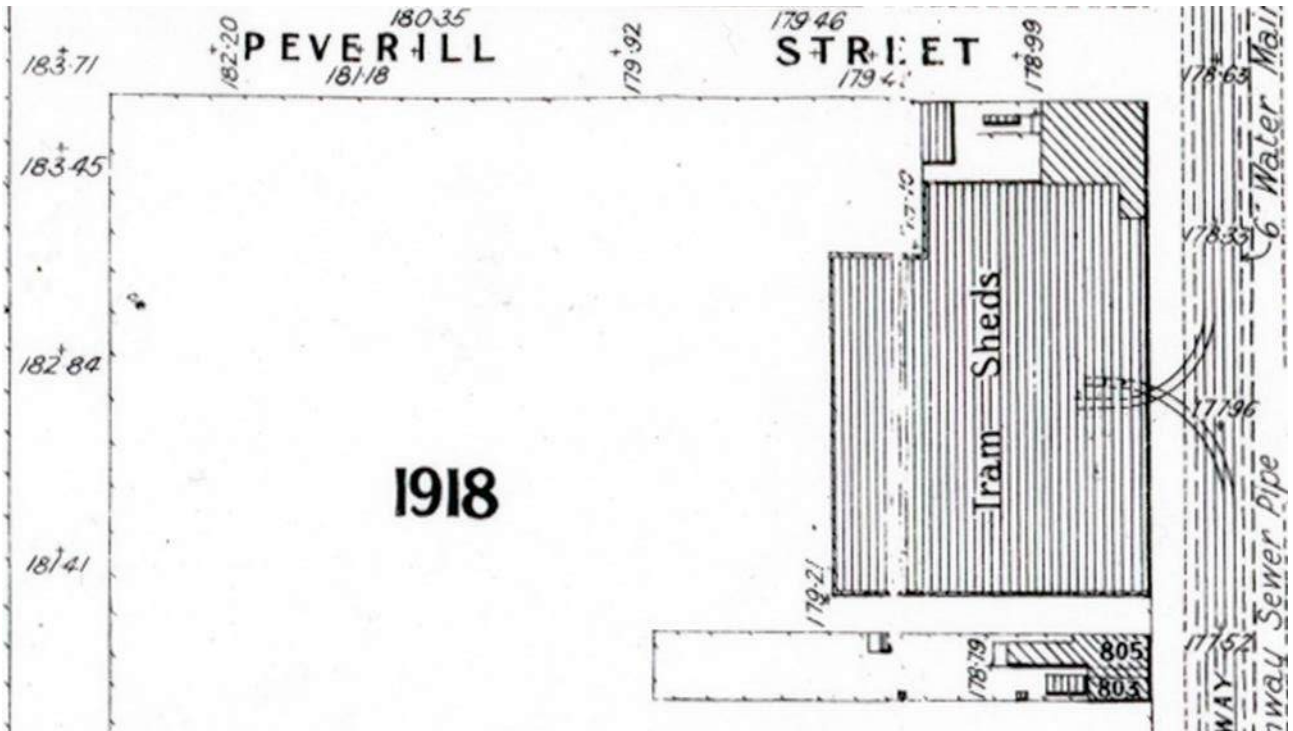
Detail of the Brunswick tram sheds from the 1906 MMBW Plan No. 104 (MMBW 1906)
